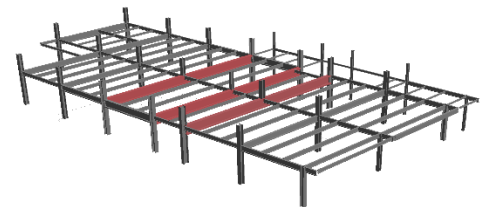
Transfer girders (red) open the Gathering Space floor layout
